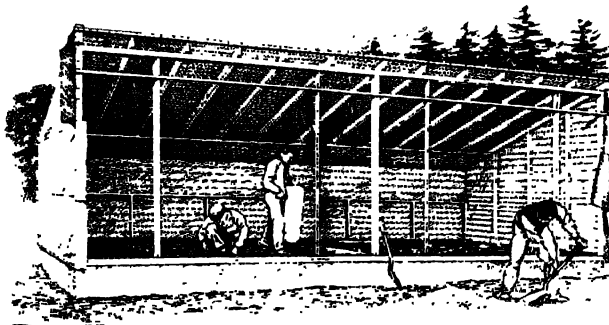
Interior of hen-house in process of construction. Finished structure shown in Fig. 555.
